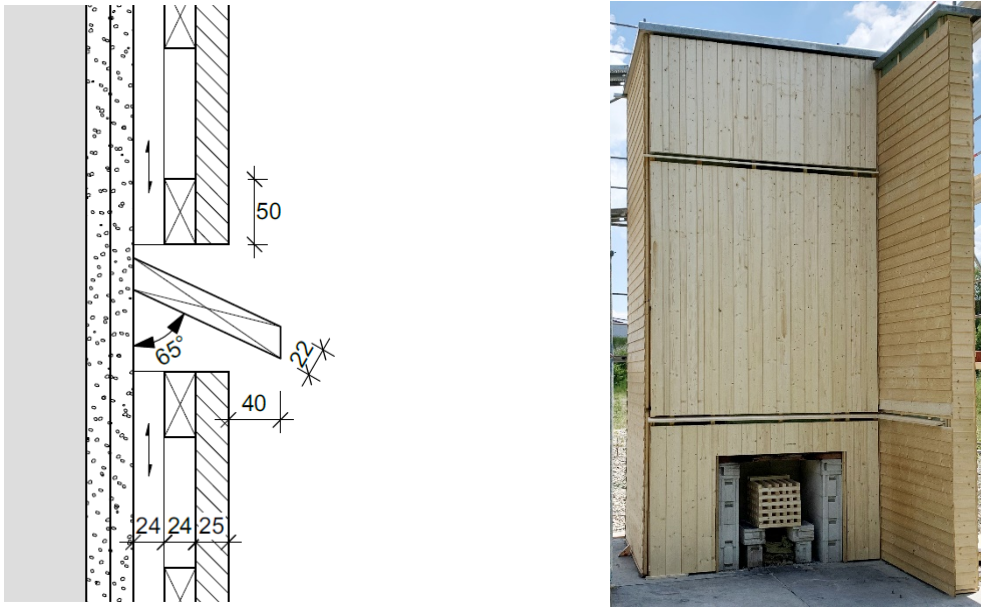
Vertical section and photo of the façade structure in Test 3 [in mm]
